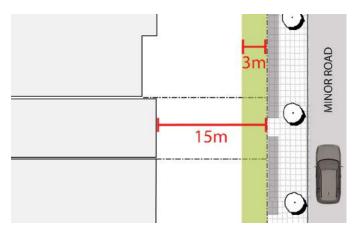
On minor roads there should be a 15m front building setback from the property boundary with a 3m (minimum) landscaped strip.
